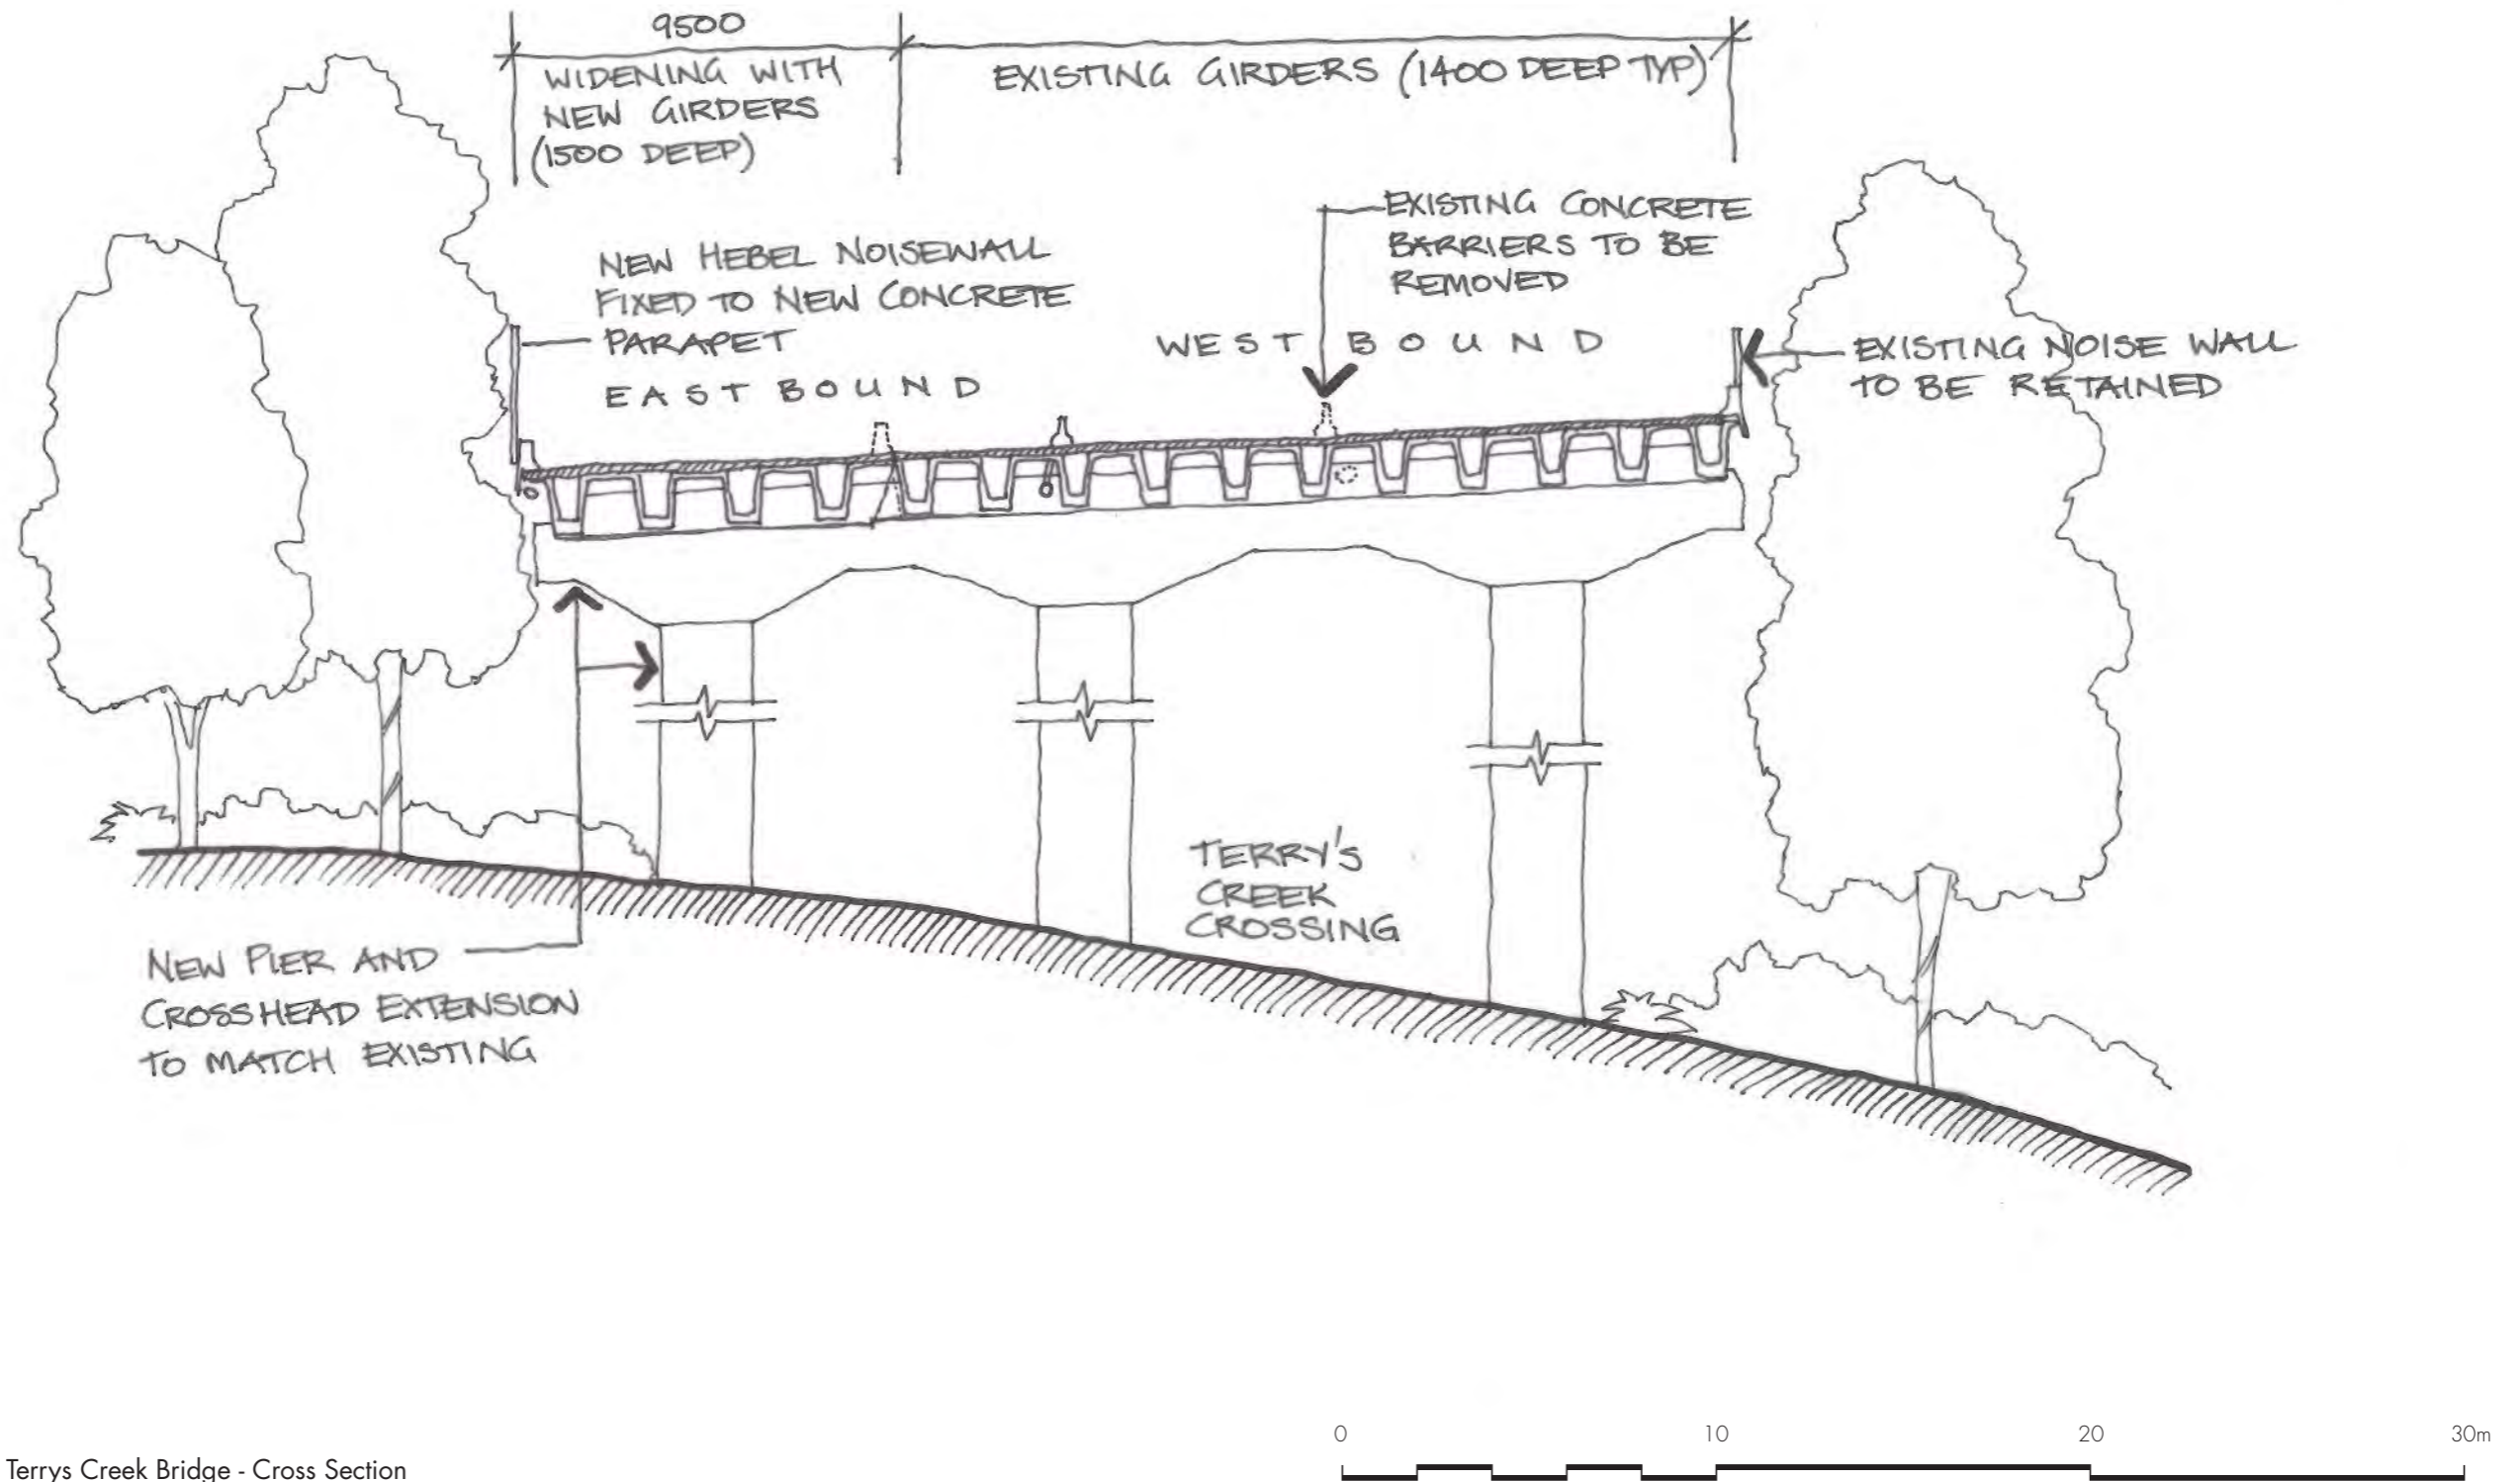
Bridge 4.1 Terry's Creek Bridge - Cross Section
